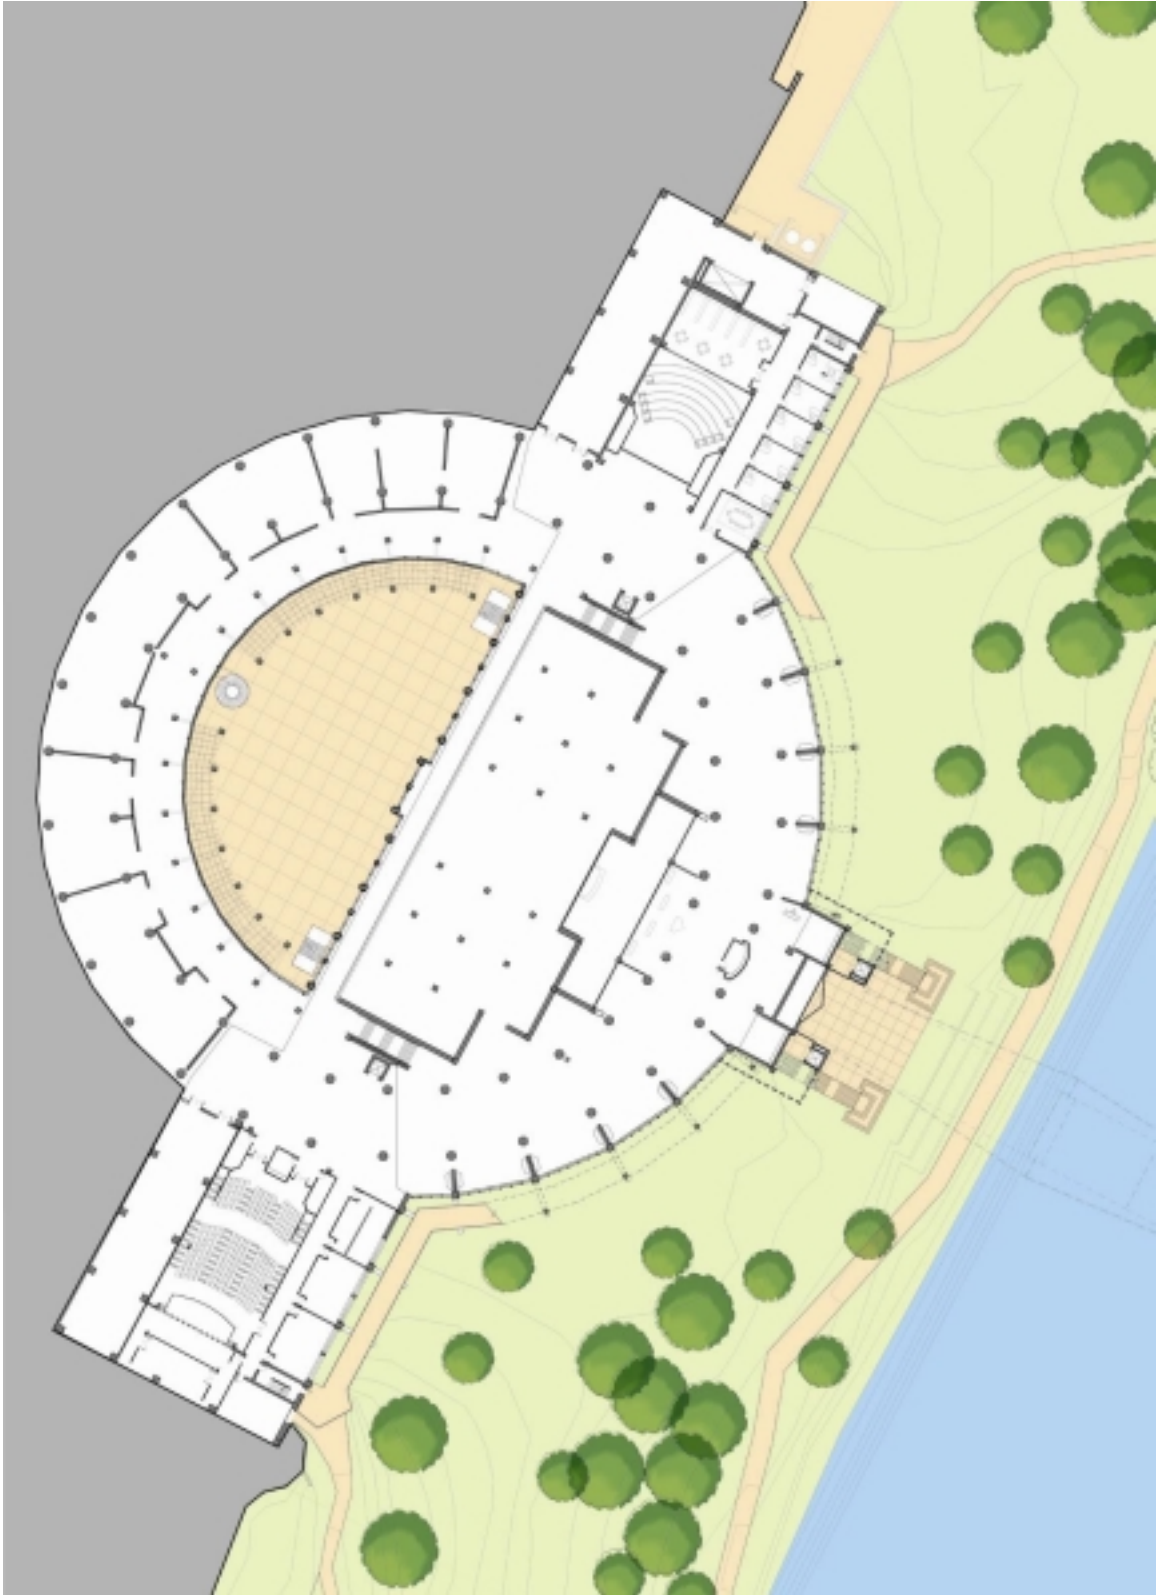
14' (Mezzanine Level) Building Floor Plan
